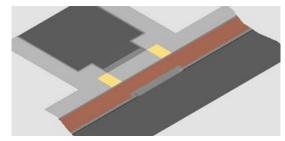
Side Road Entry Treatment (Ranty Highwayman)
